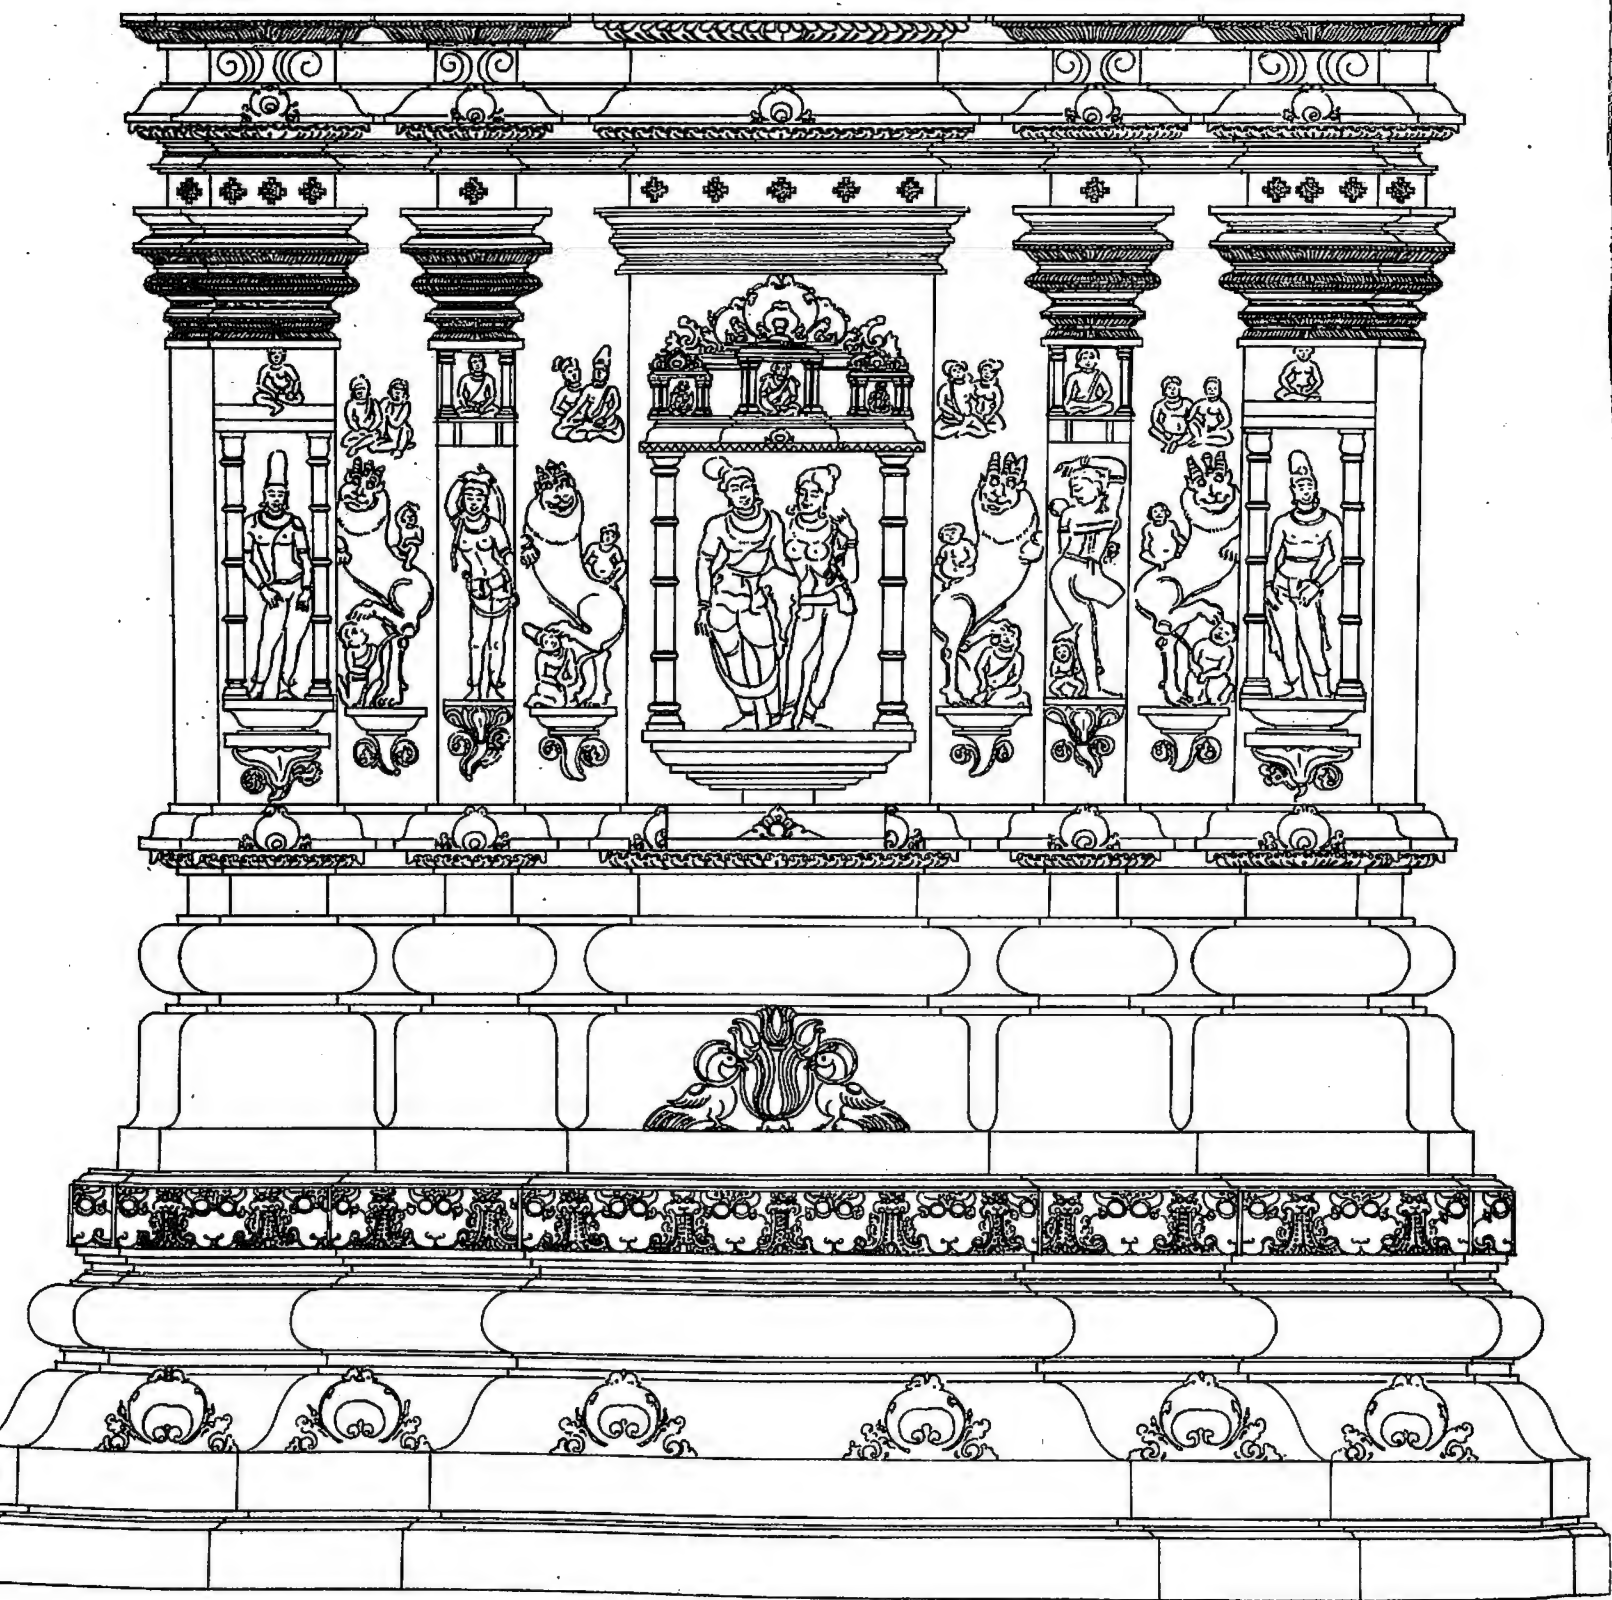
Candrāvati. Old temple, back elevation. (Reconstruction after Tod.)
